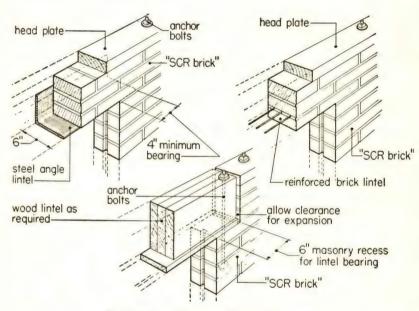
Three Methods of Lintel Construction Courtesy of Structural Clay Products Institute
